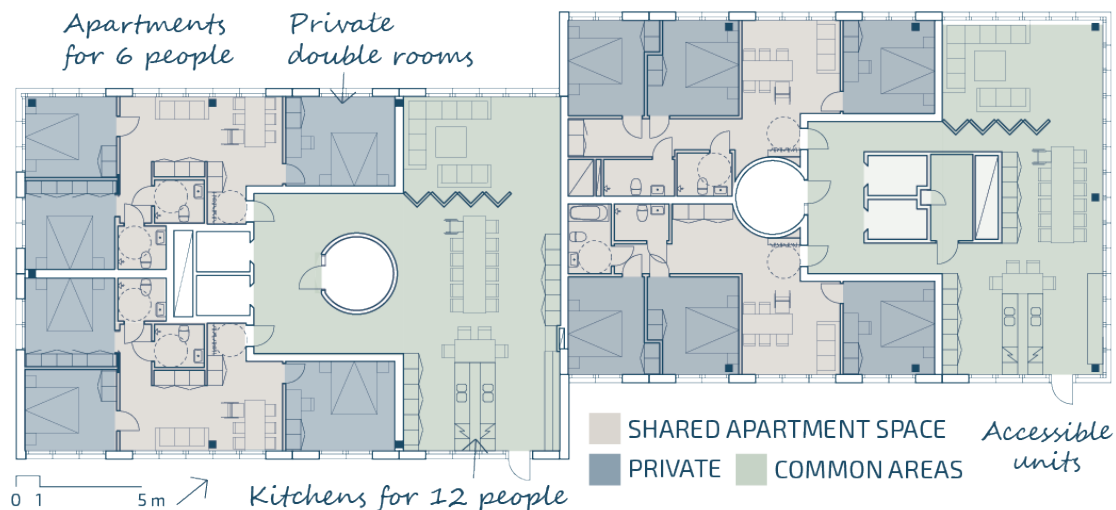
Floor plan for option Open co-living, adapted from Eriksson (2024)
